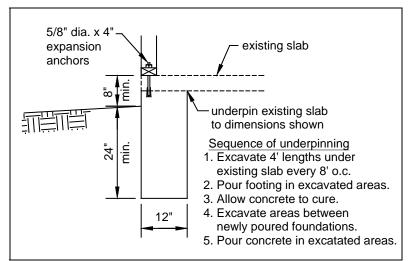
TYPICAL UNDERPINNING DETAIL
